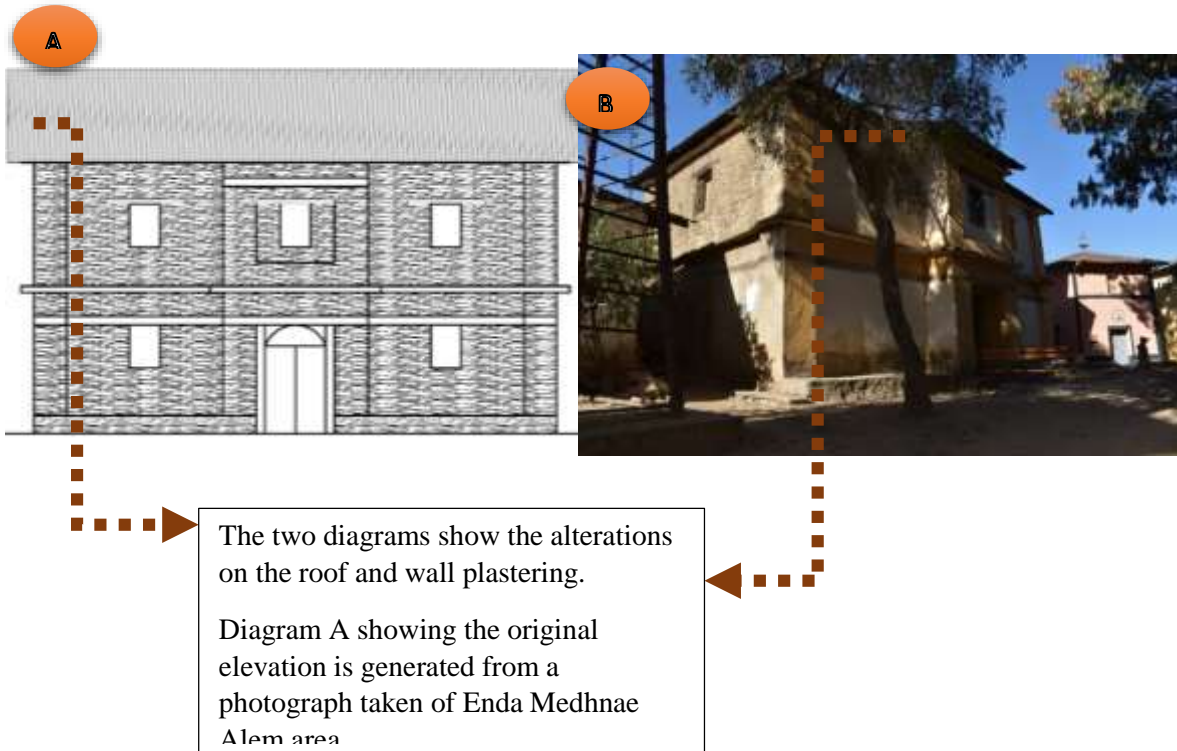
Enda Medhane Alem artifact storage "Eka Bete" roof alteration
